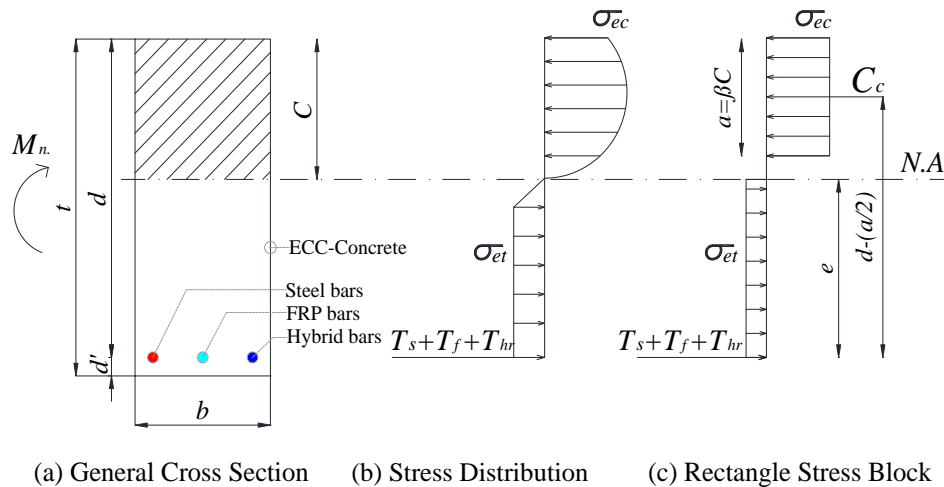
Cross Section Stress Distribution for PVA-ECC Concrete Beams.
